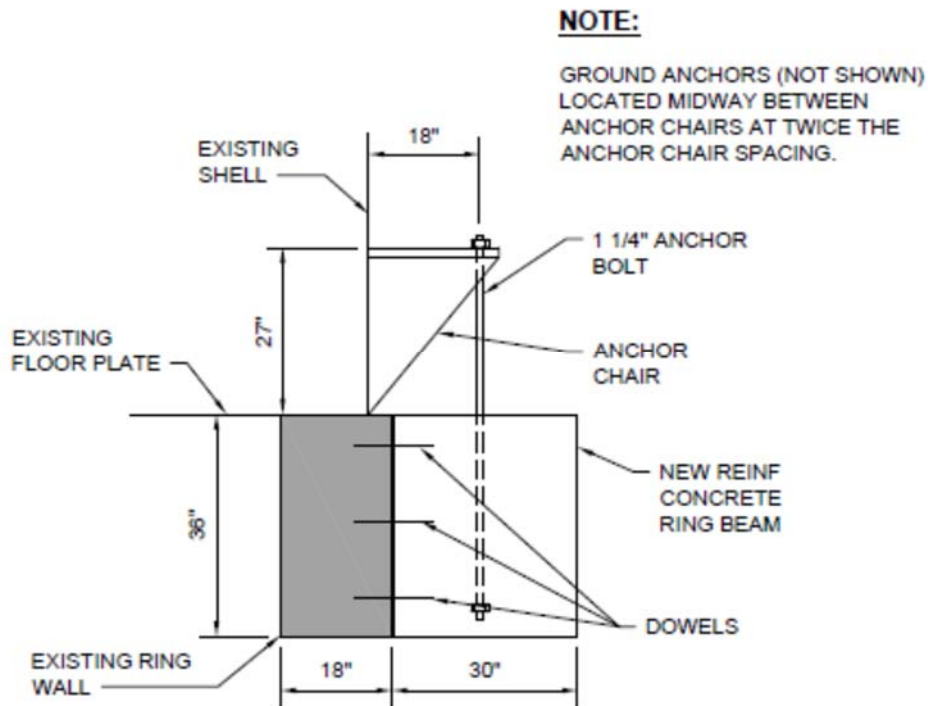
Supplementary External Ringwall with Anchor Bolts and Ground Anchors
